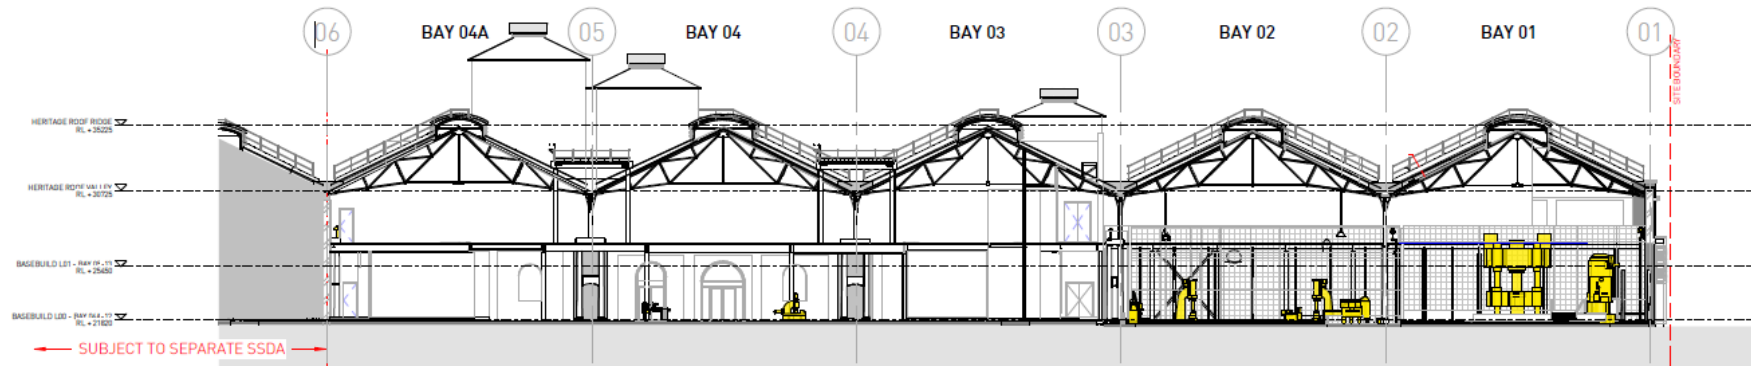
Proposed Long Section A – Retail (Source: Sissons, 2019)
